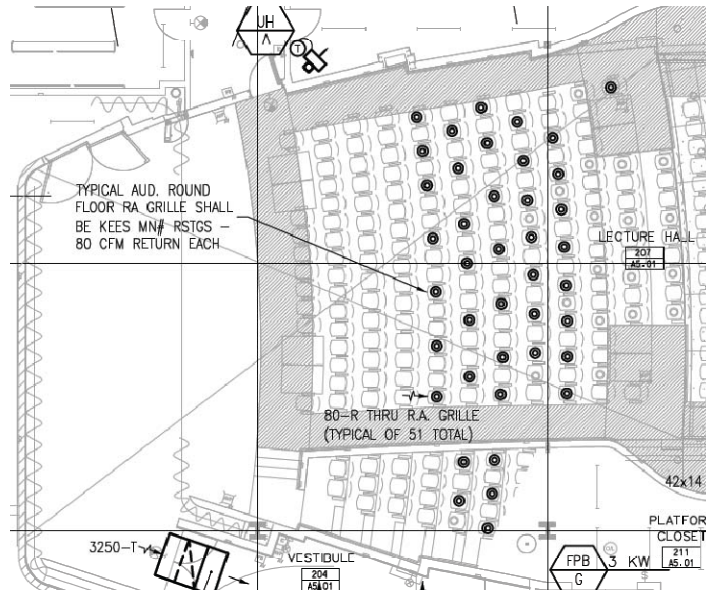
LOCATIONS OF UNDERFLOOR AIR RETURN GRILLES
